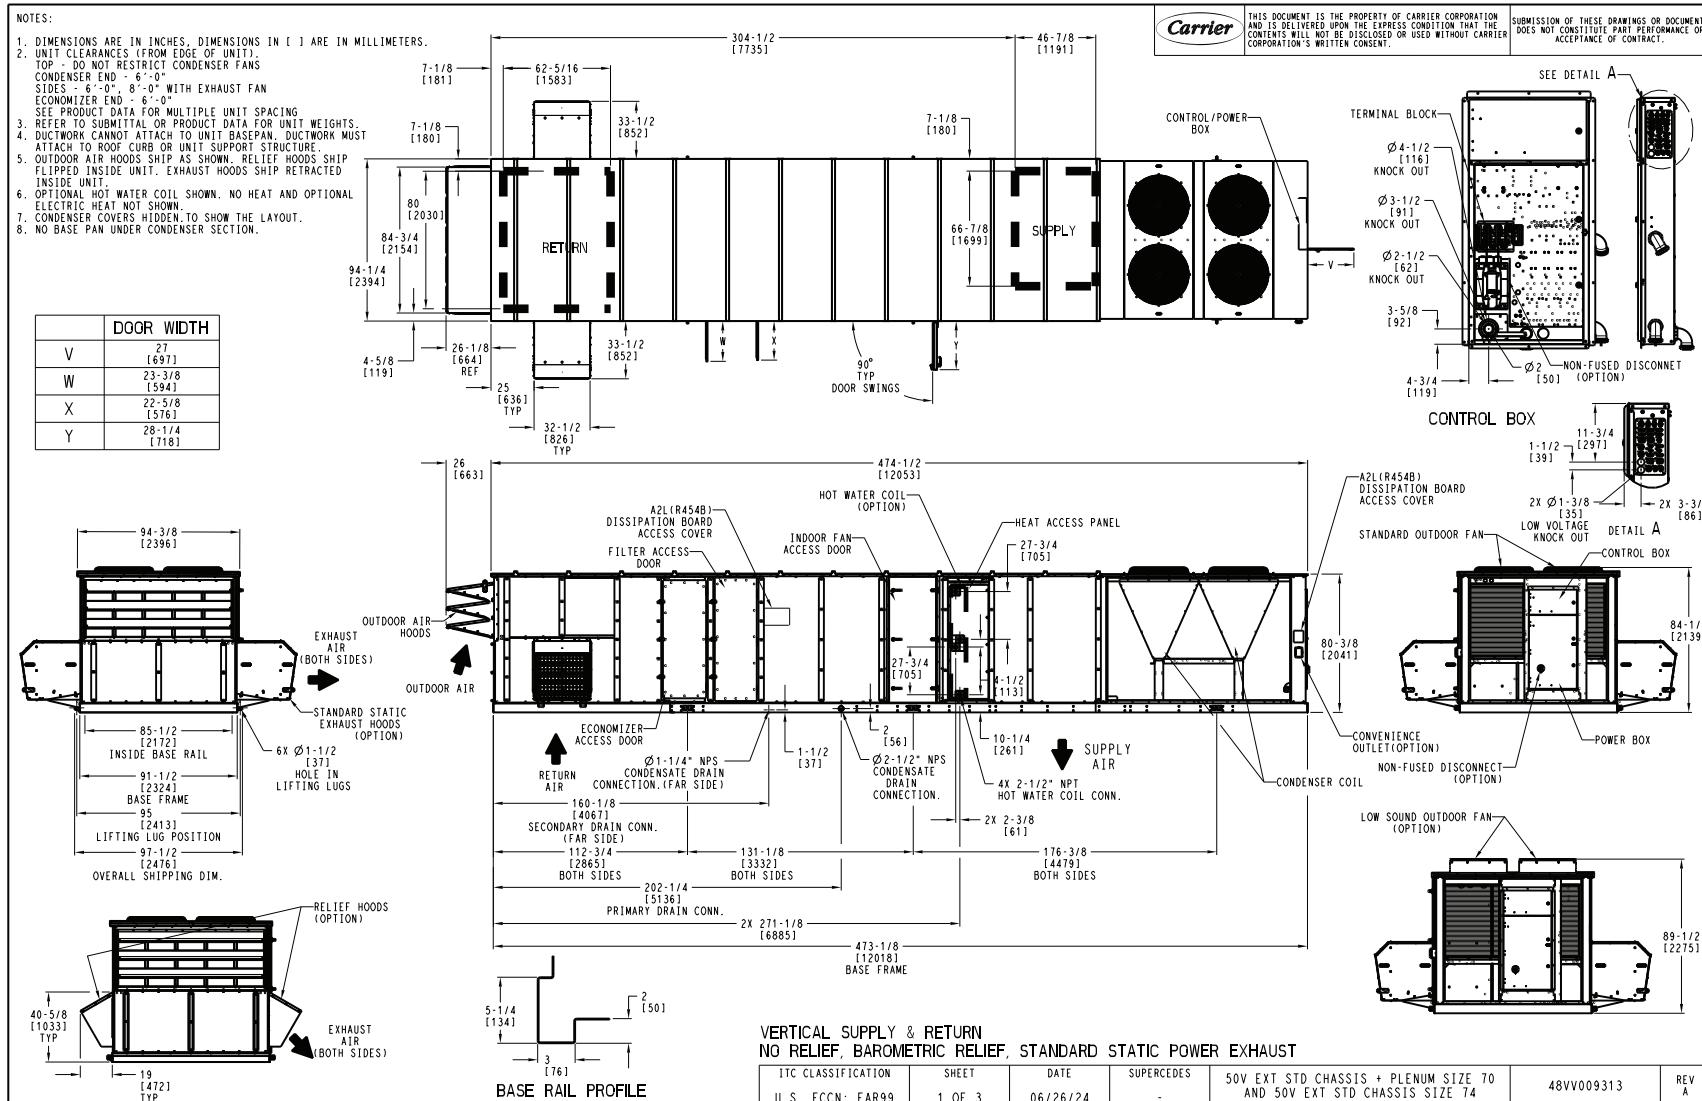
50V 70 Ton Extended Standard Chassis with Plenum and 50V 75 Ton Extended Standard Chassis
